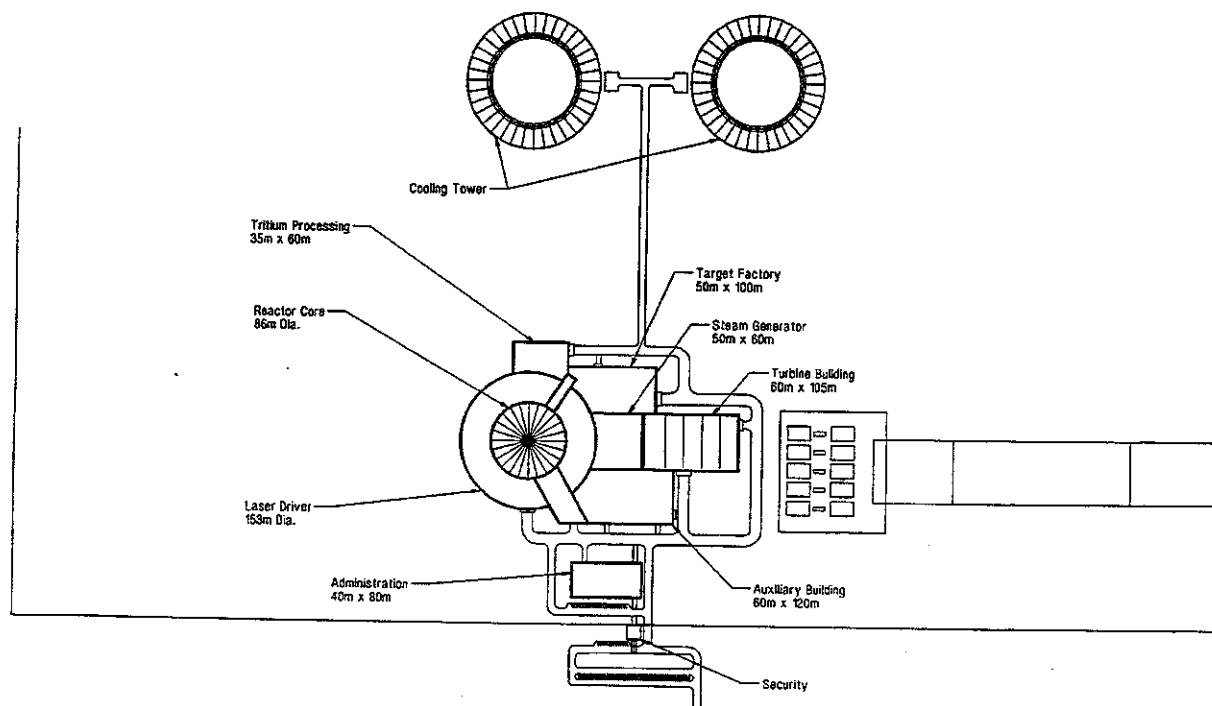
Prometheus-L Plant Site Plan View
